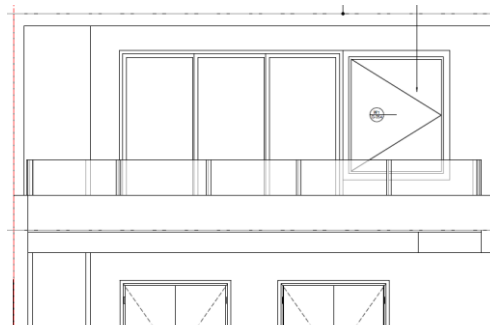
Proposed front elevation - 7/274 Arden Street, Coogee (Source: Place Studio)
